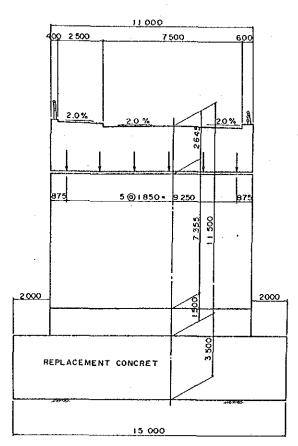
Design Recommendation for Type of Abutment and Piers
